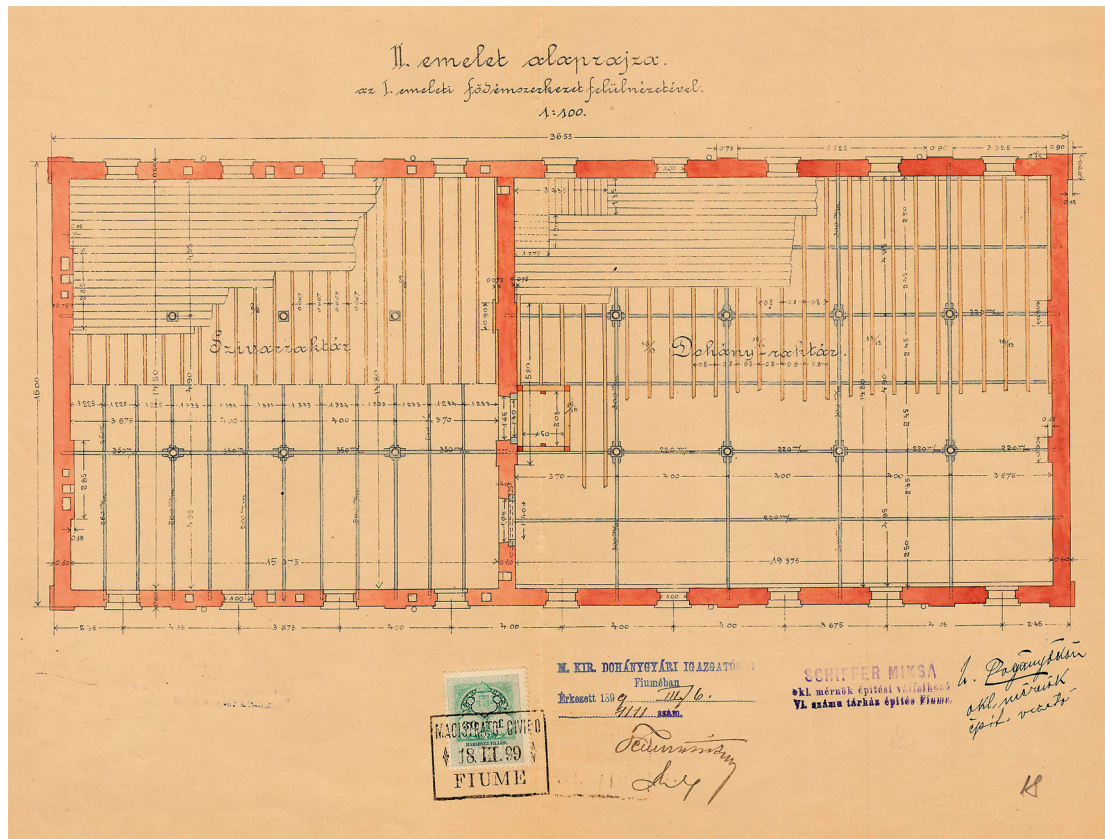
Tobacco drying facility, plan of the second floor — old (right) and new (left) part of the building. State Archives in Rijeka (HR-DARI), reproduced with permission.
